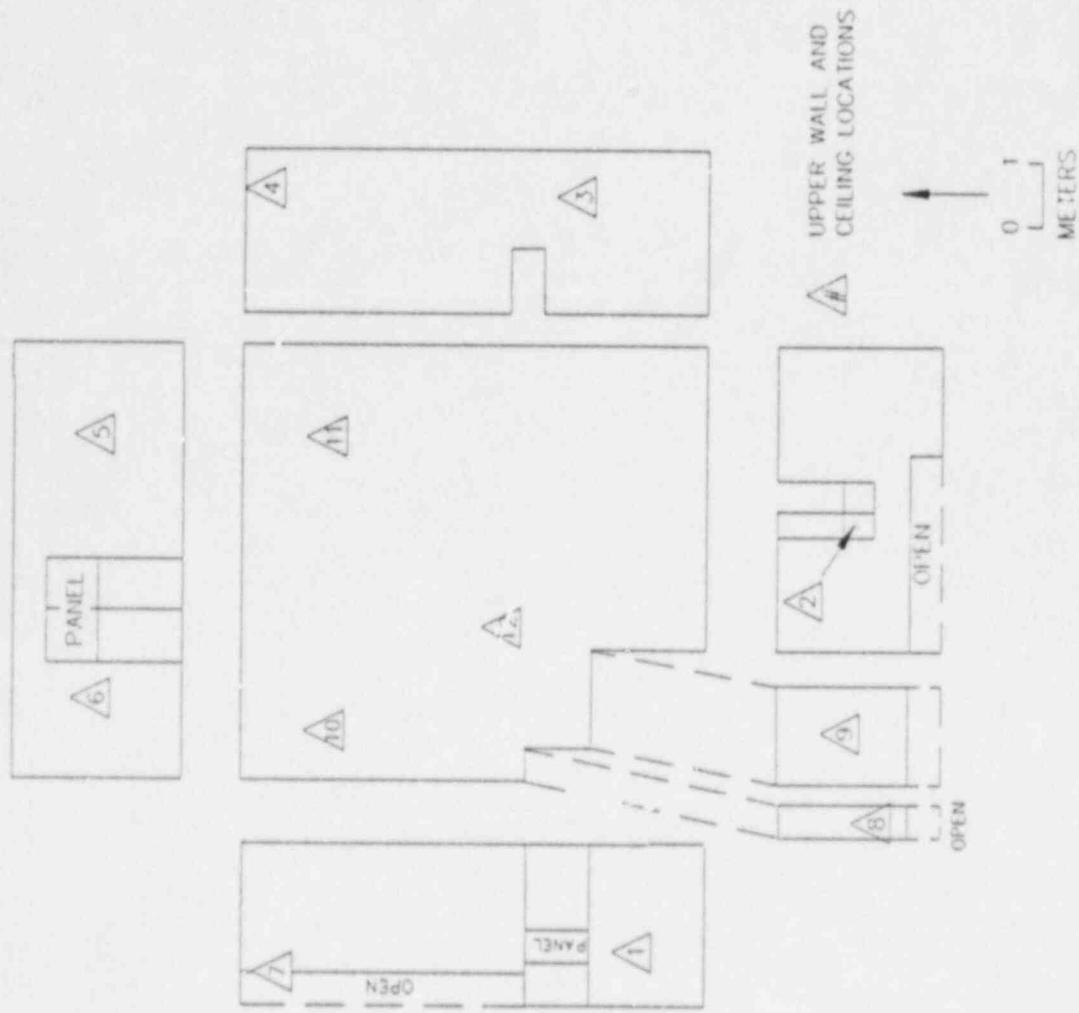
Room 20 Showing Locations of Upper Walls and Ceiling Single-point Measurements
